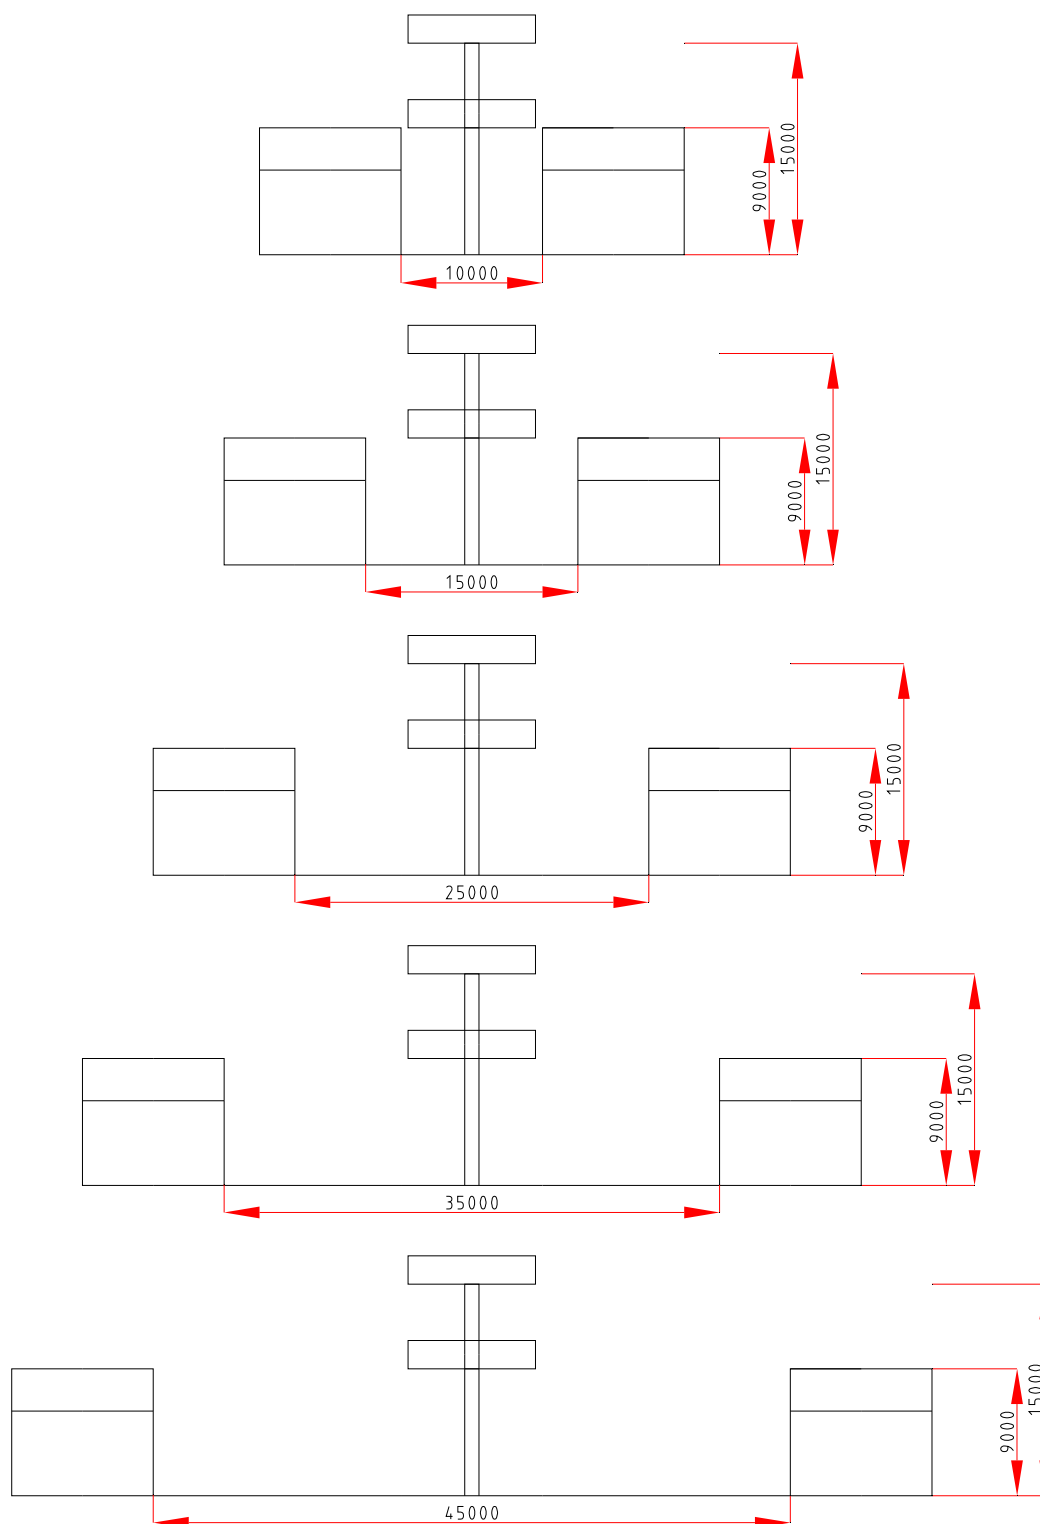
Impression of the minimum and maximum elevated metro structure within different street widths (in mm)
